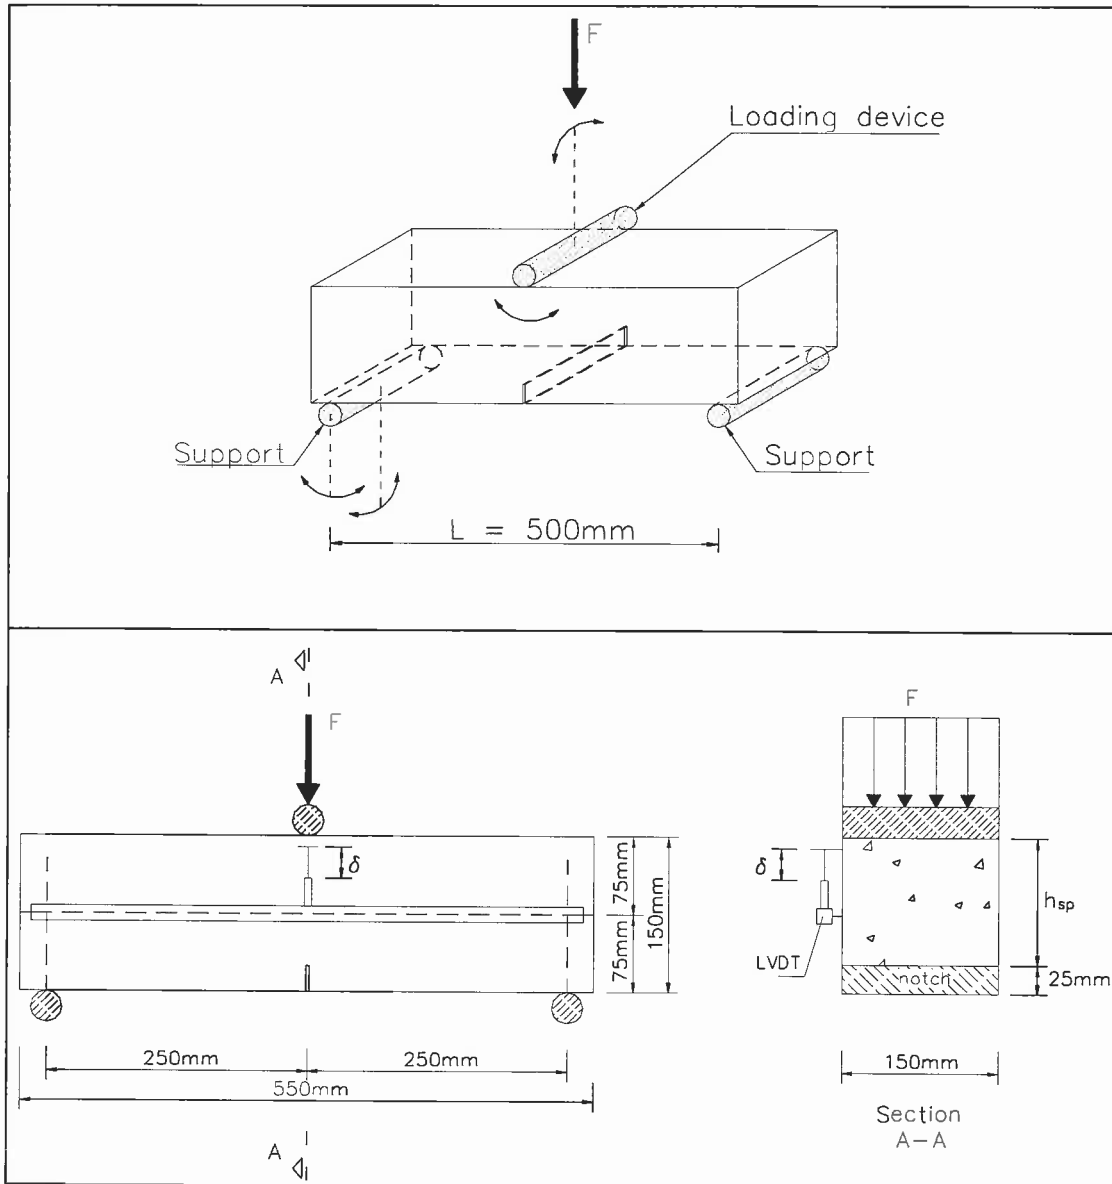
Specimen dimensions, loading and support conditions, and arrangement of the displacement transducers of the RILEM flexural tensile test.
